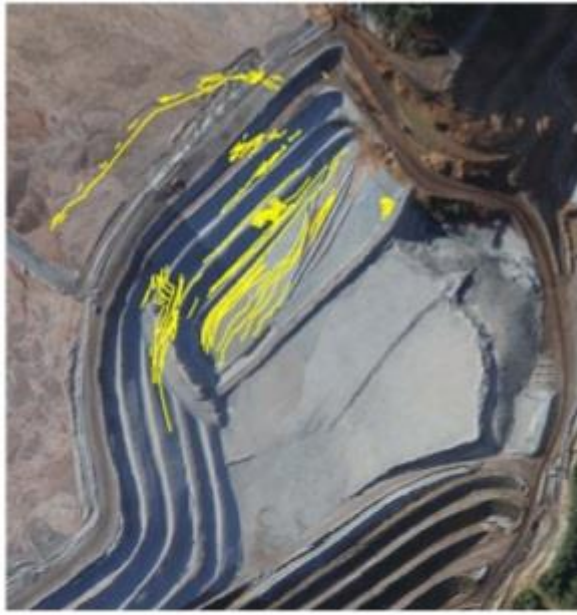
August 27, 2014 cracking at left abutment setback
